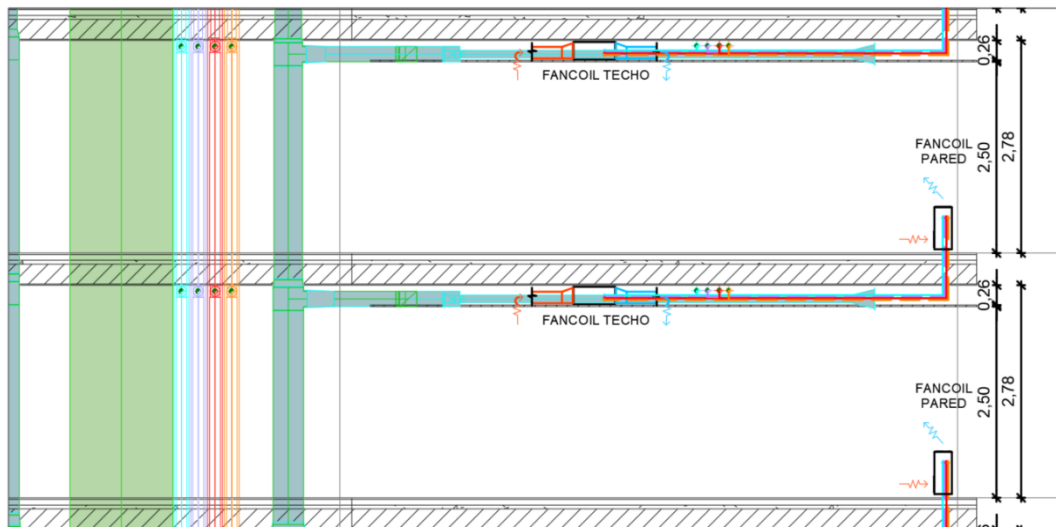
Plan section of standard plan, alternative 1 (source: AIGUASOL).
